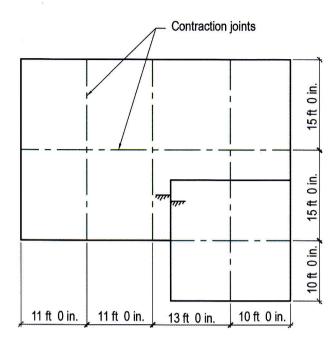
Contraction joint layout for a PT slab (Note: 1 ft = 0.3 m)
